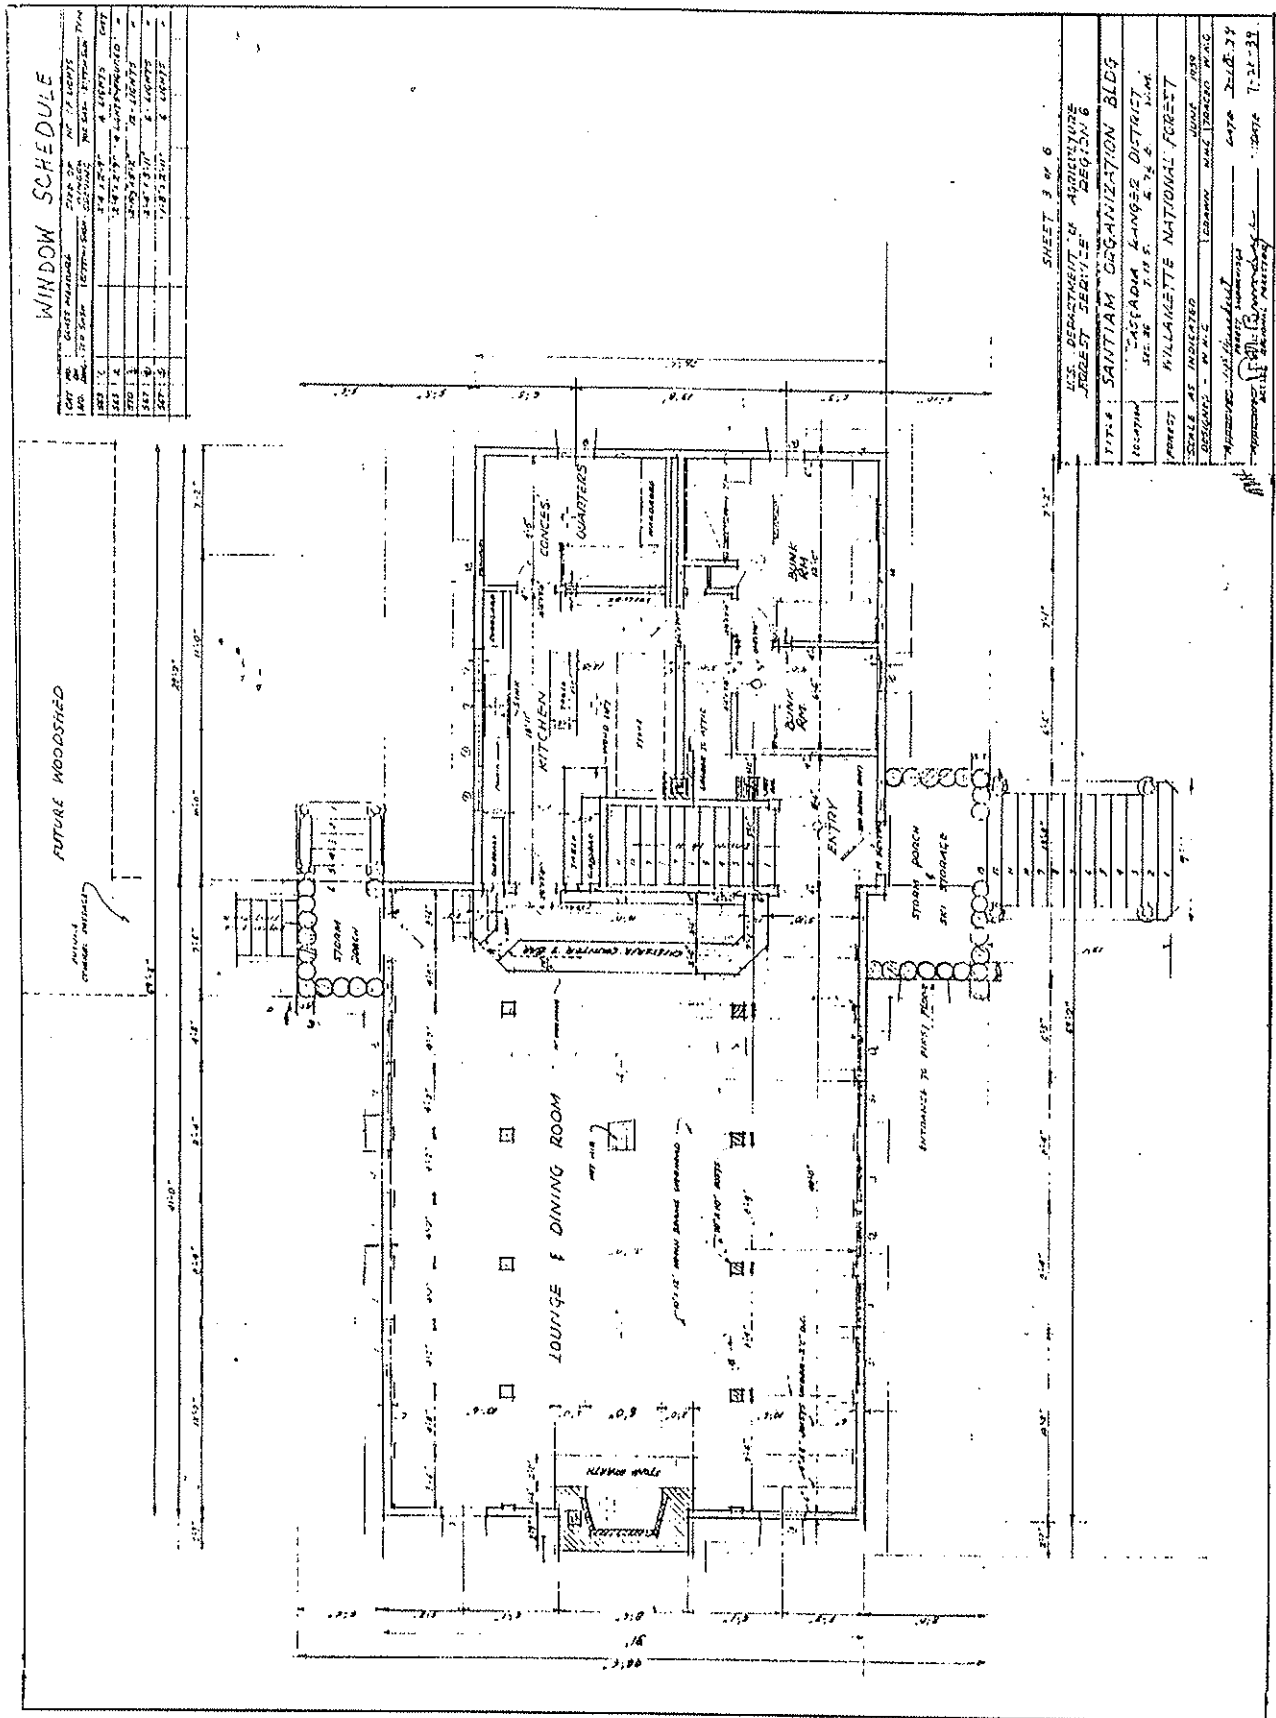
Santiam Organization Building: Main Floor Plan (1939). Adapted from original prints on file at the Willamette National Forest. Note: Plans for future addition (woodshed) behind main structure.
